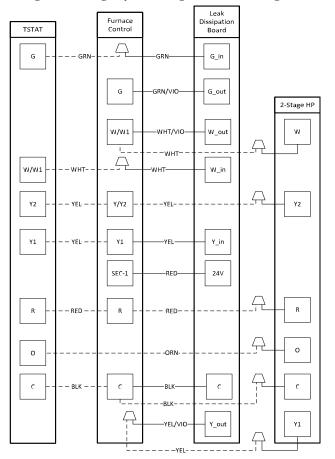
Wiring Layout, 2-Stage Heat Pump Unit
